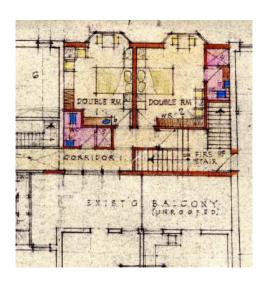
Rear of 139–141 George Street, First Floor c.1985 (detail). The two double rooms indicated are today's Room 7 (1.45) and Room 8 (1.43) (facing onto Nurses Walk), although 1.45 has recently been altered to provide an accessible bathroom. This plan shows the opening made in the party wall with 137 George Street to provide access from the Fortune of War Hotel into the new fire stair. Source: PMNSW – ROX 410 AR 0001/DR.
